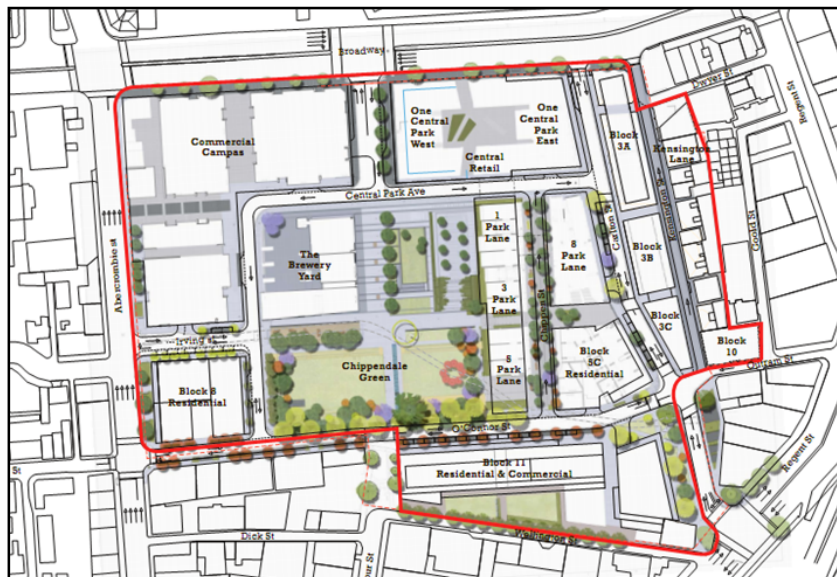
Site plan showing the overall Central Park development site, with Block 6+7 on the eastern edge of the site.
